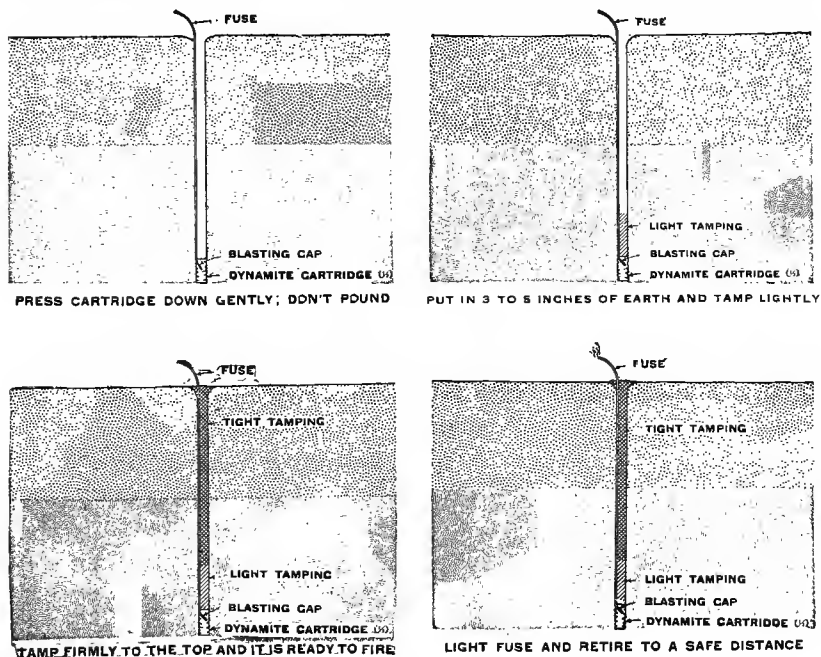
DIFFERENT STEPS IN LOADING AND TAMPING A HOLE
